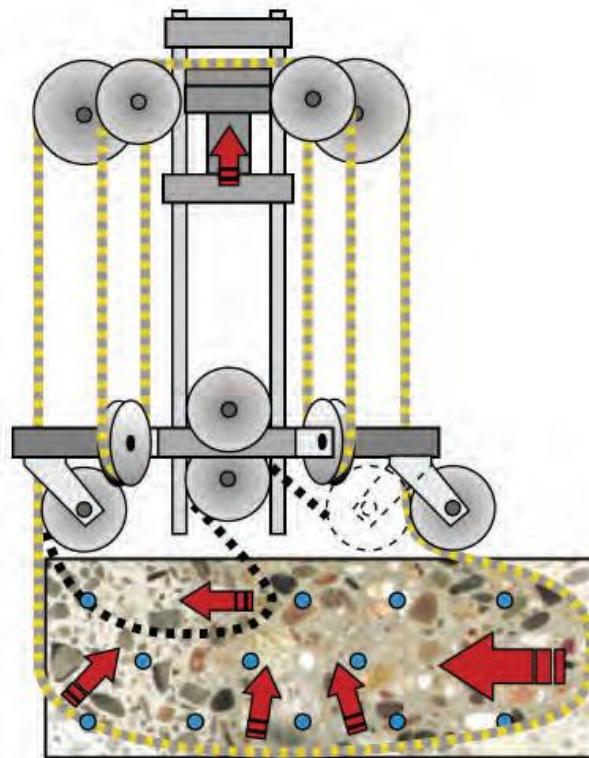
Diamond wire cutting a reinforced concrete slab¹¹¹
